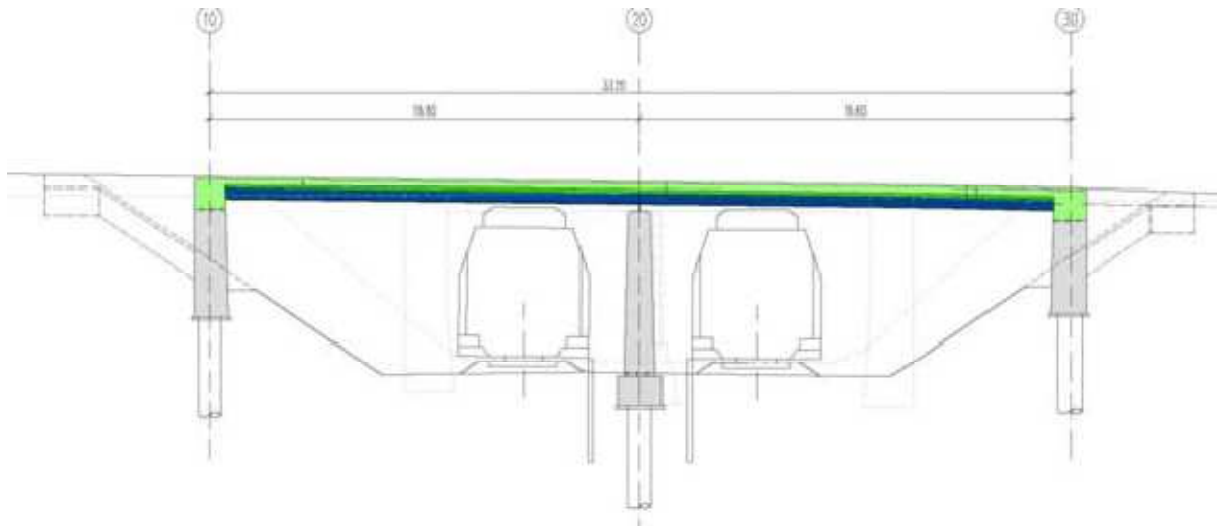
Longitudinal section of the bridge in Pöcking.
